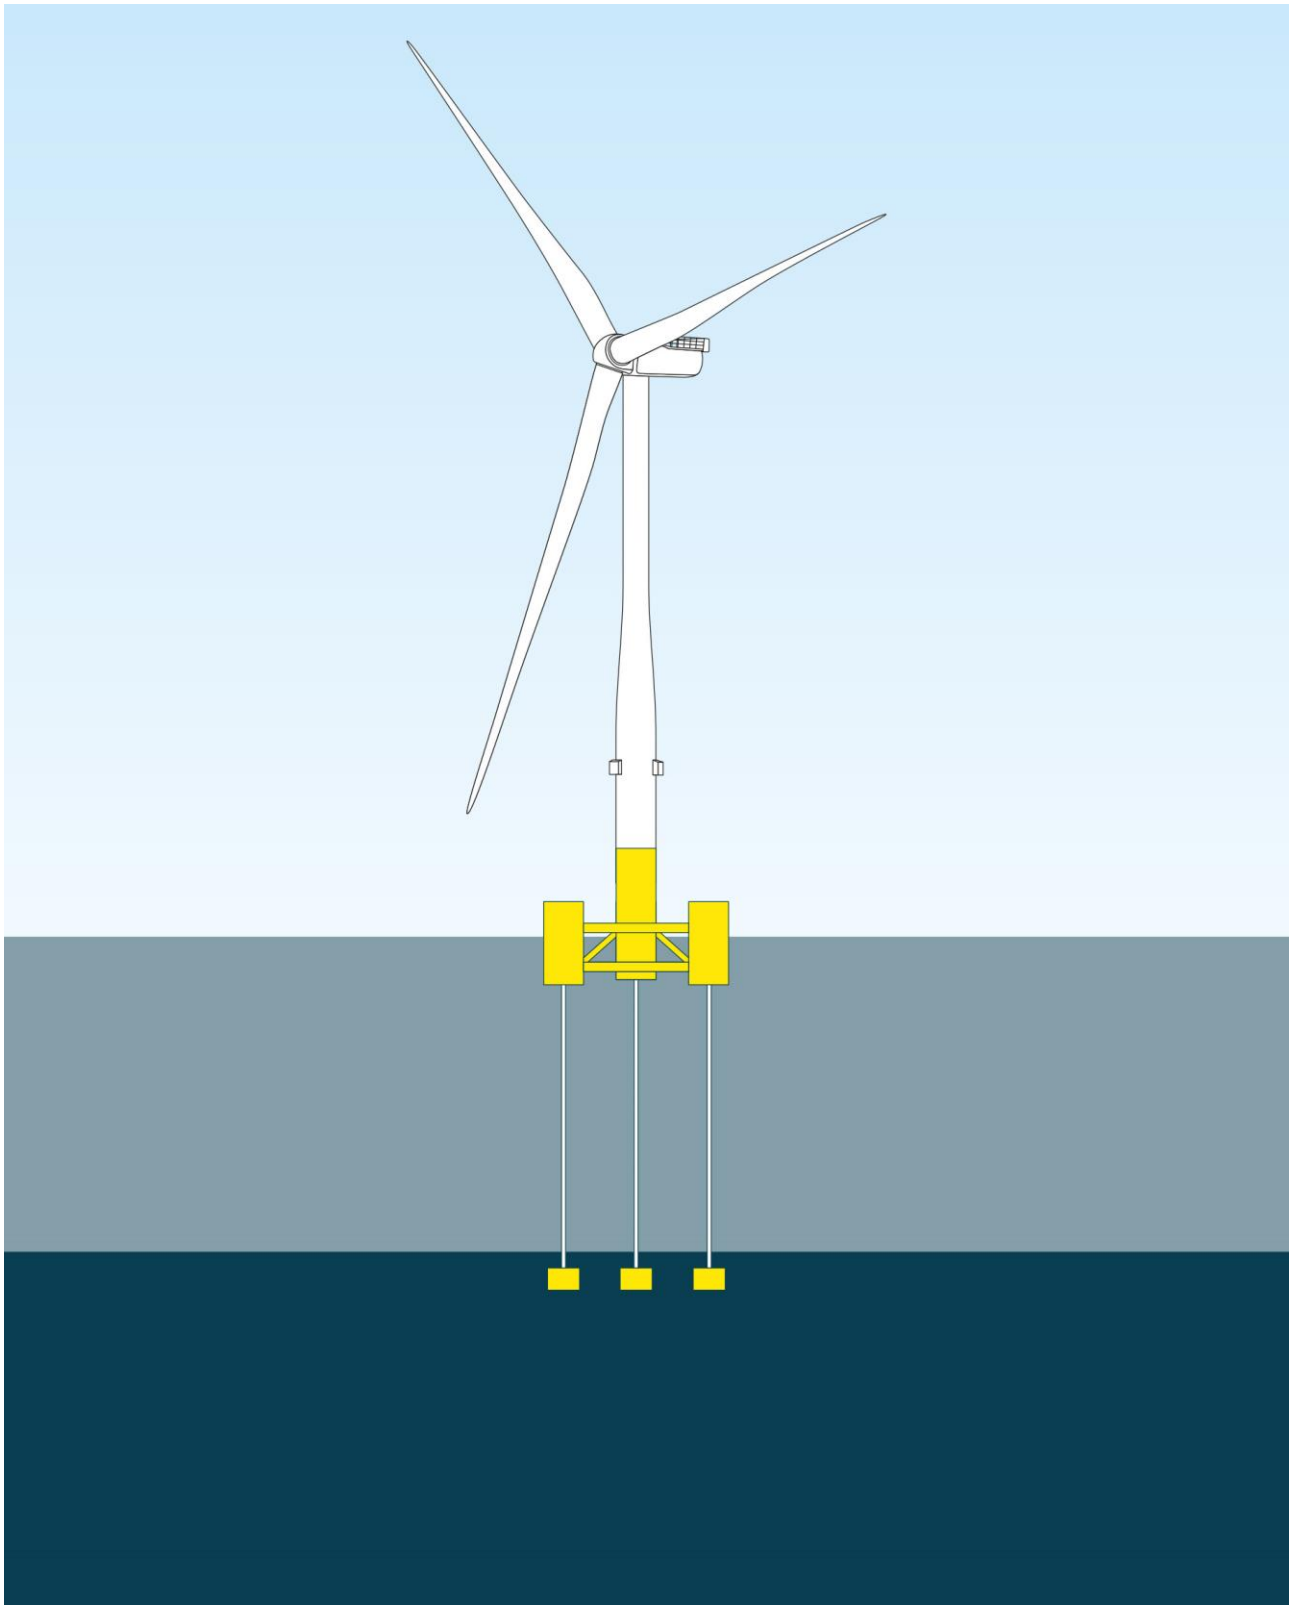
Indicative design of a tension leg platform WTG foundation.
